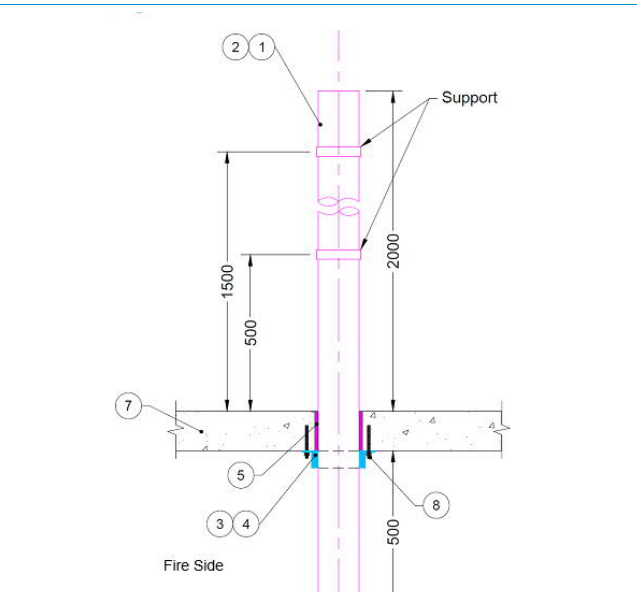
Plastic pipes with PROMASEAL® FC collars (floor side view)
